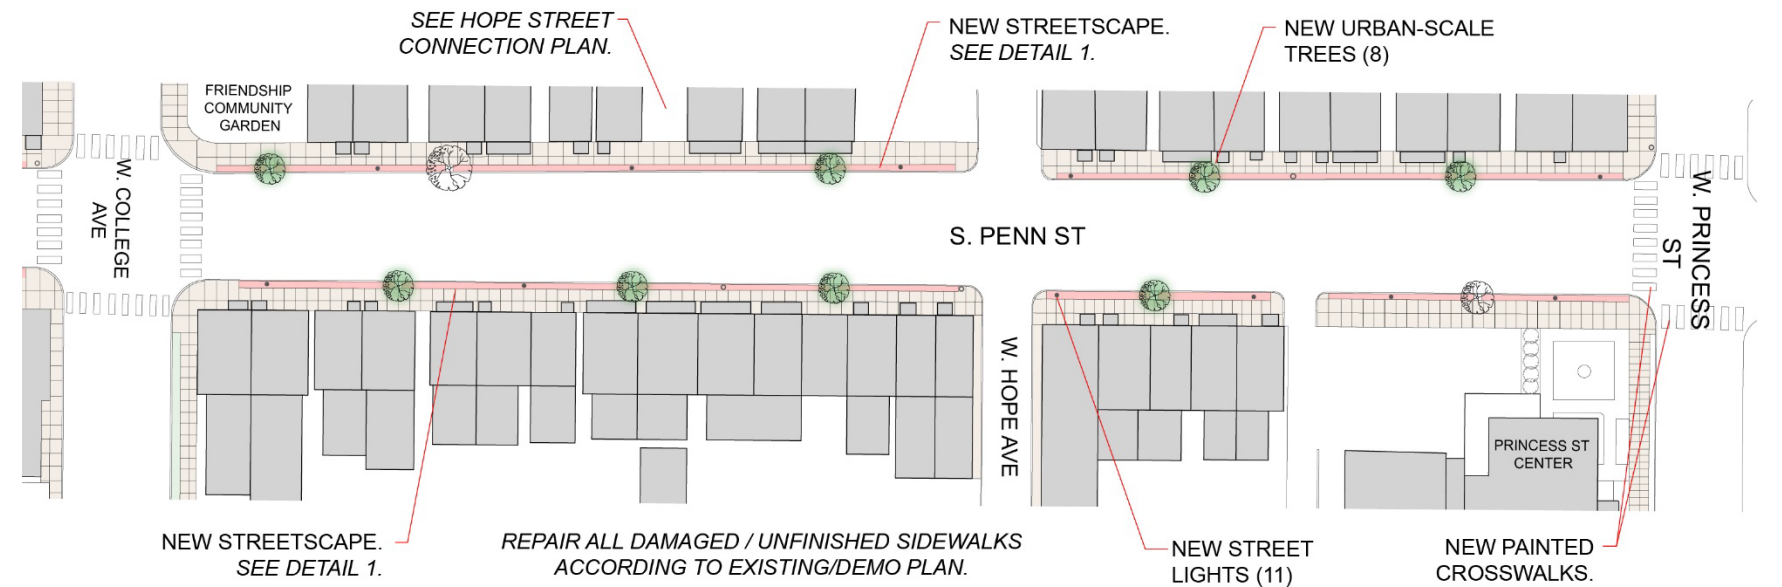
Walkability Diagram: MLK Park to West College Avenue
